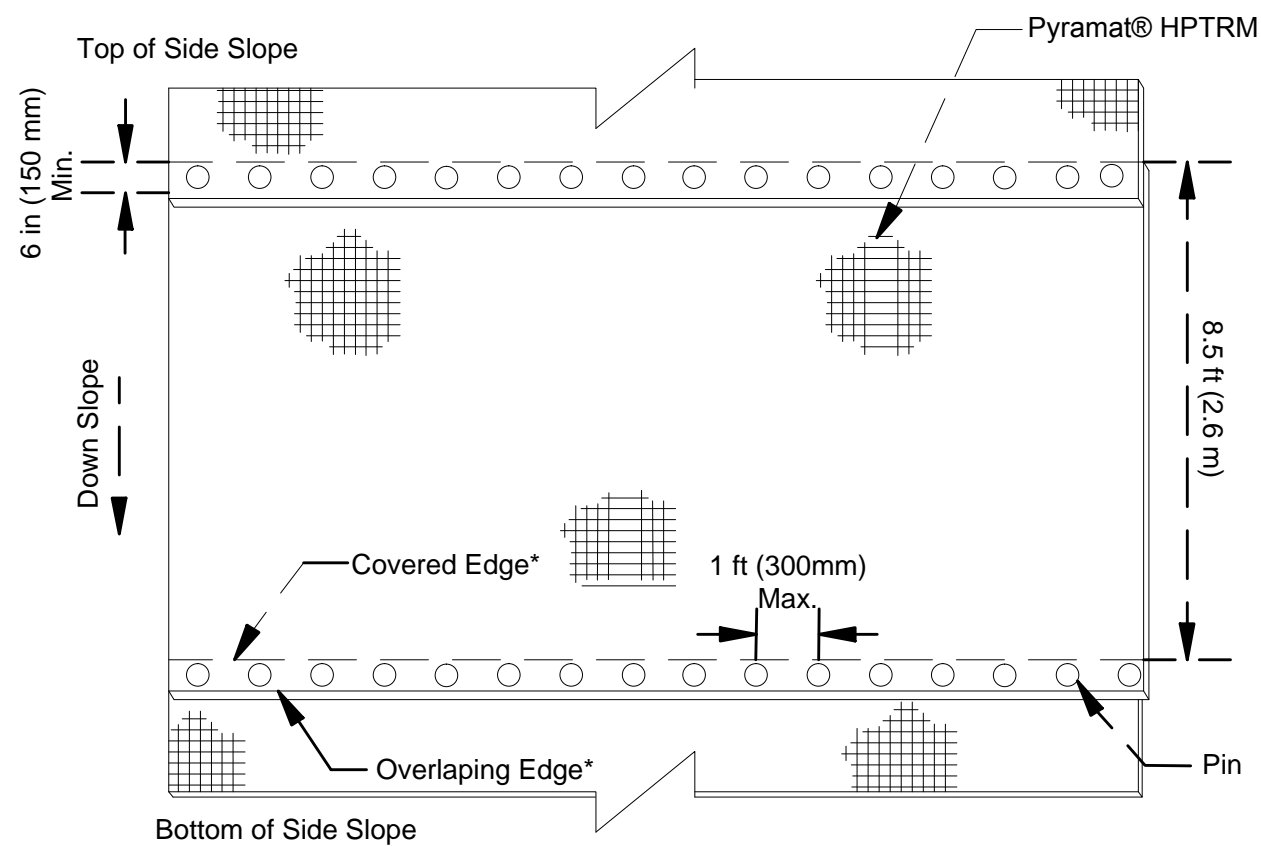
OVERLAP AT ROLL EDGE DETAIL
